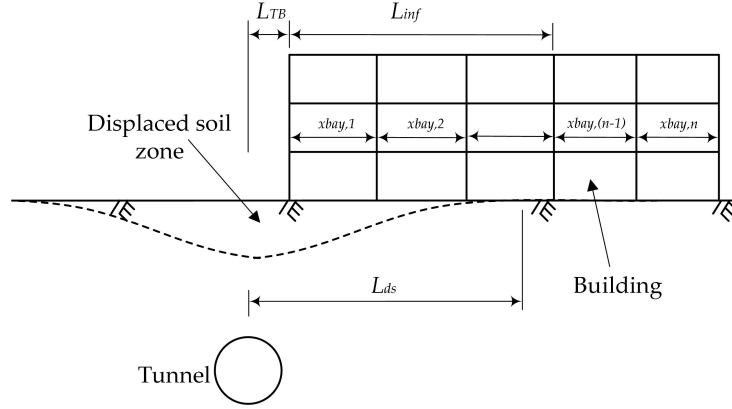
Soil and building zones affected by tunnelling induced ground displacements
